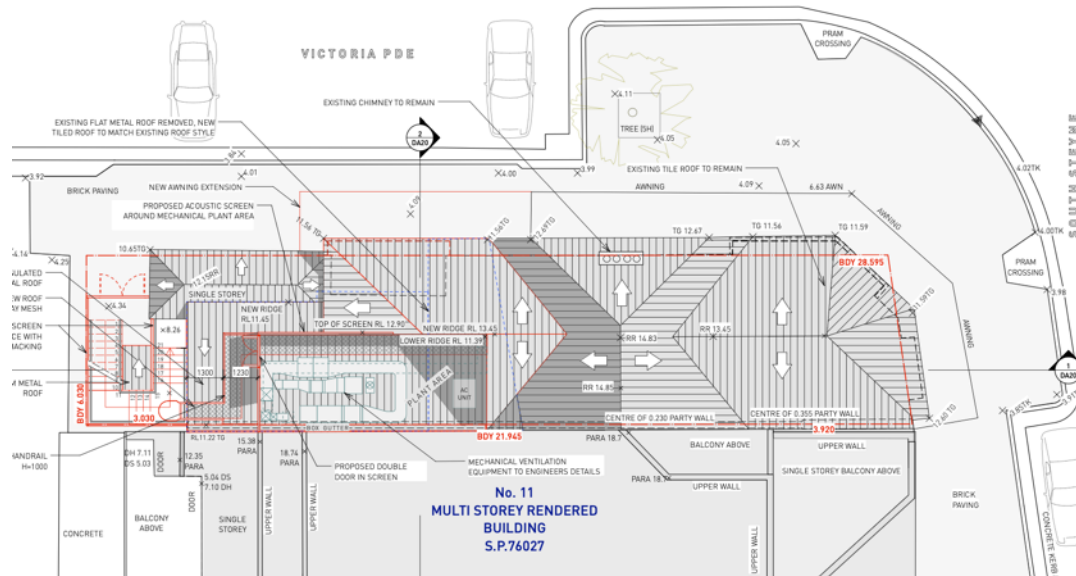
, Proposed roof plan, U+I Building Studio, Mar 2021.
